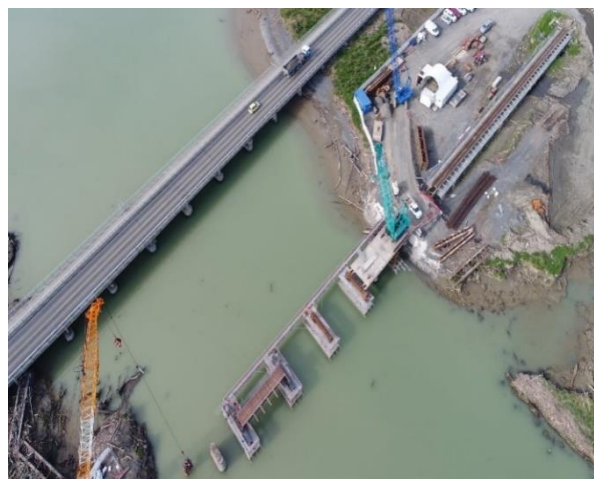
Construction of temporary bridge for Br 217 PNGL (Source: TREC)
